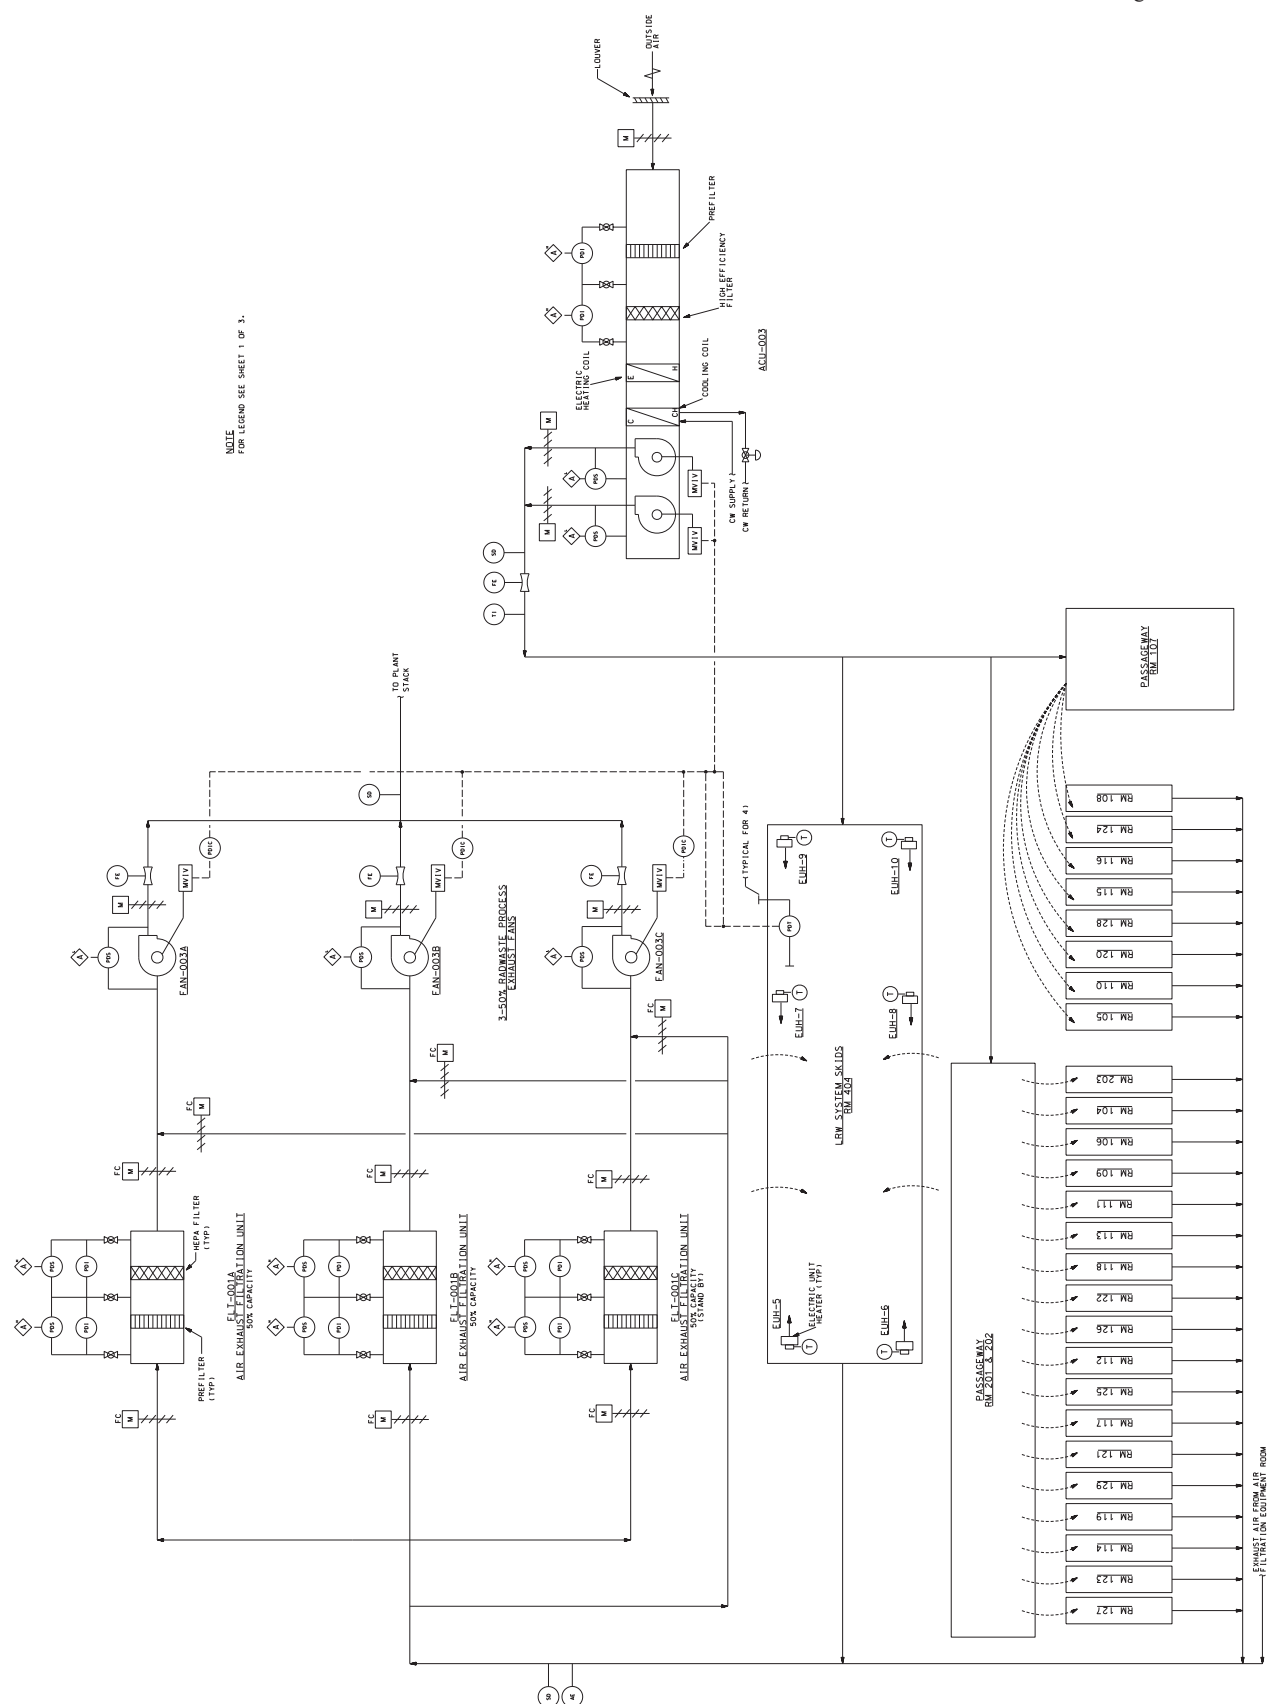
Radwaste Building HVAC P&ID (Sheet 3 of 3)
